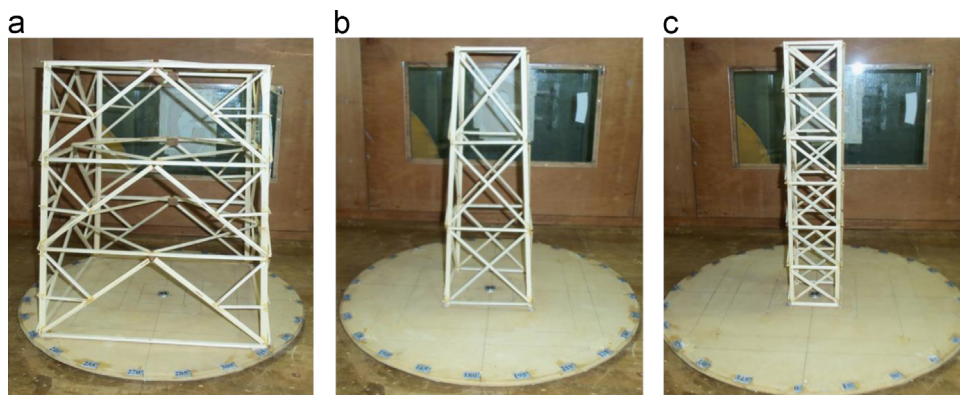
Tower section models: (a) section 1, (b) section 2, and (c) section 3.
